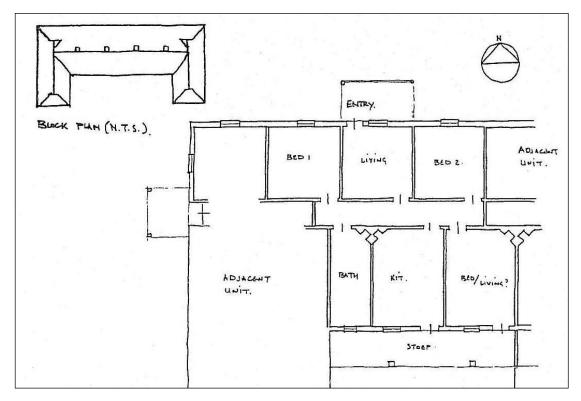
General roof plan of double storey housing units at ERPM (Radford, 1990).
